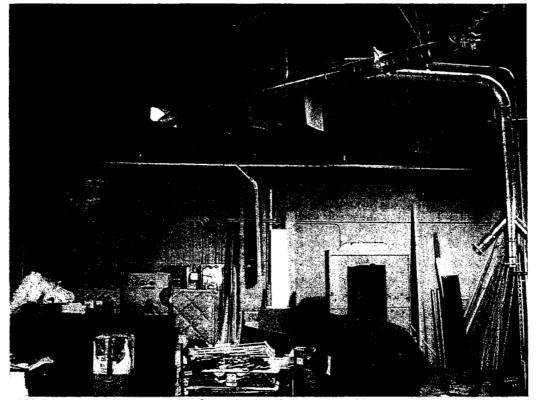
Northwest corner of warehouse, formerly used by a woodworking business.
